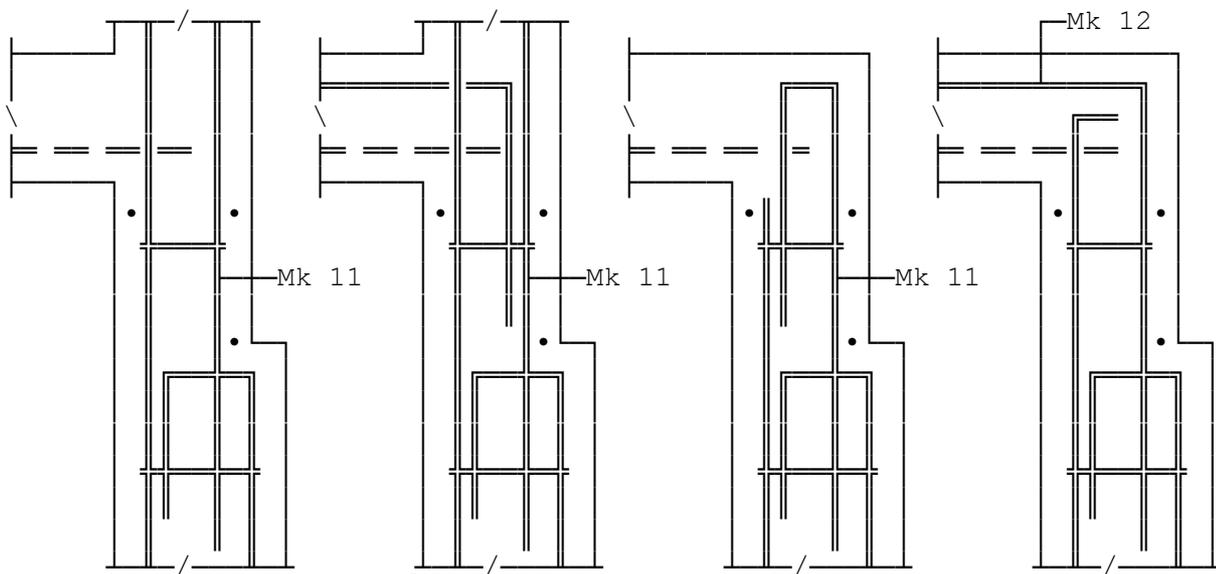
(b) - STEPPED PANELS - SUMMARY OF VERTICAL SECTIONS
